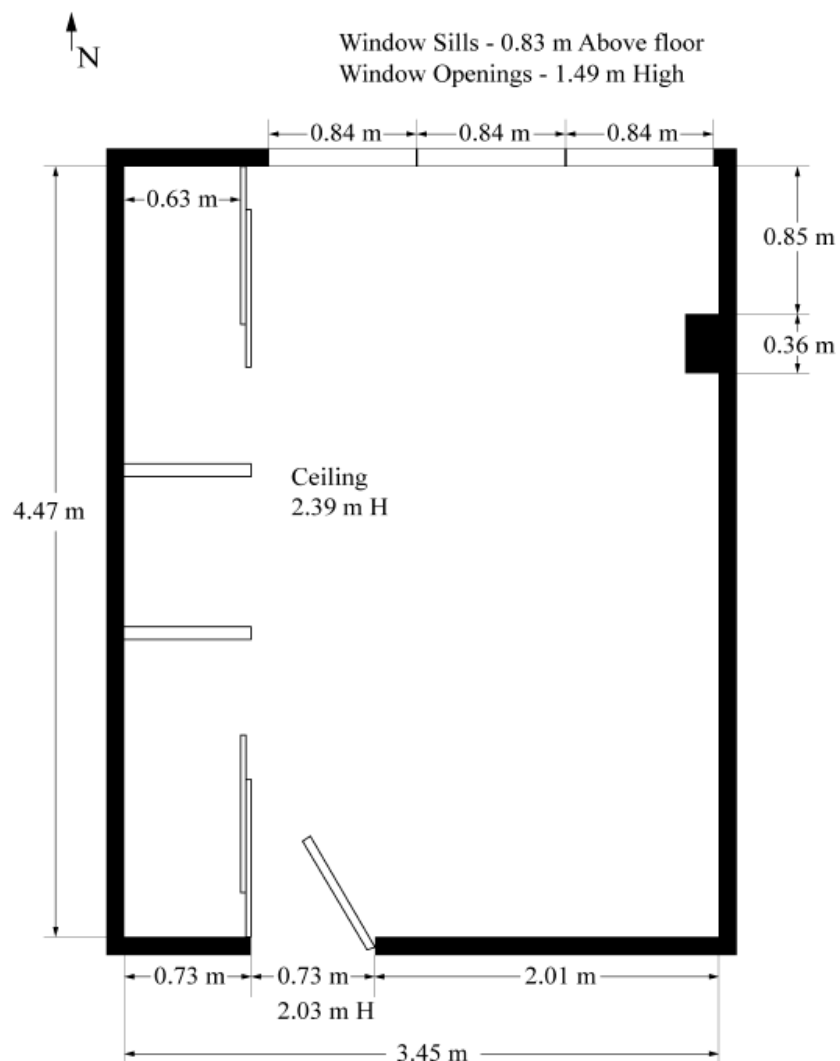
Floor plan of a sleeping room used as the fire room (Madrzykowski and Walton, 2010)
